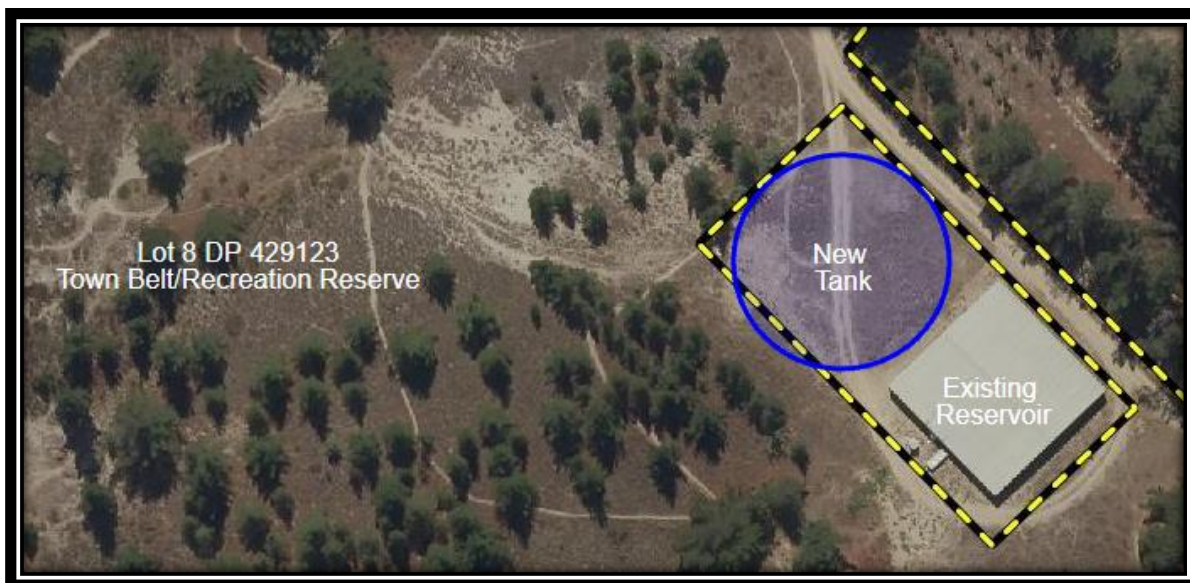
Outline plan of the new tank next to the existing reservoir on Lot 1 DP 27045 (not to scale).
